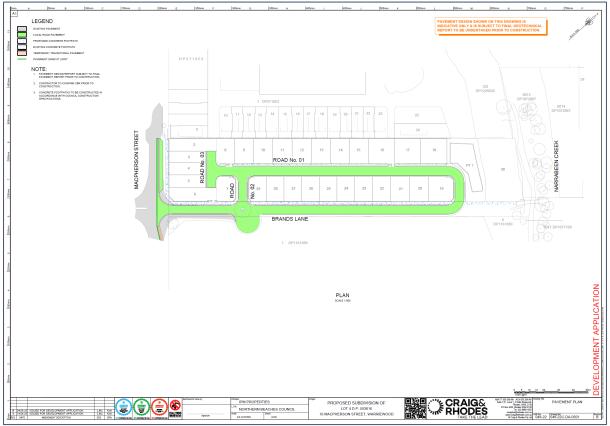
Proposed pavement plan (Source: Craig & Rhodes)
